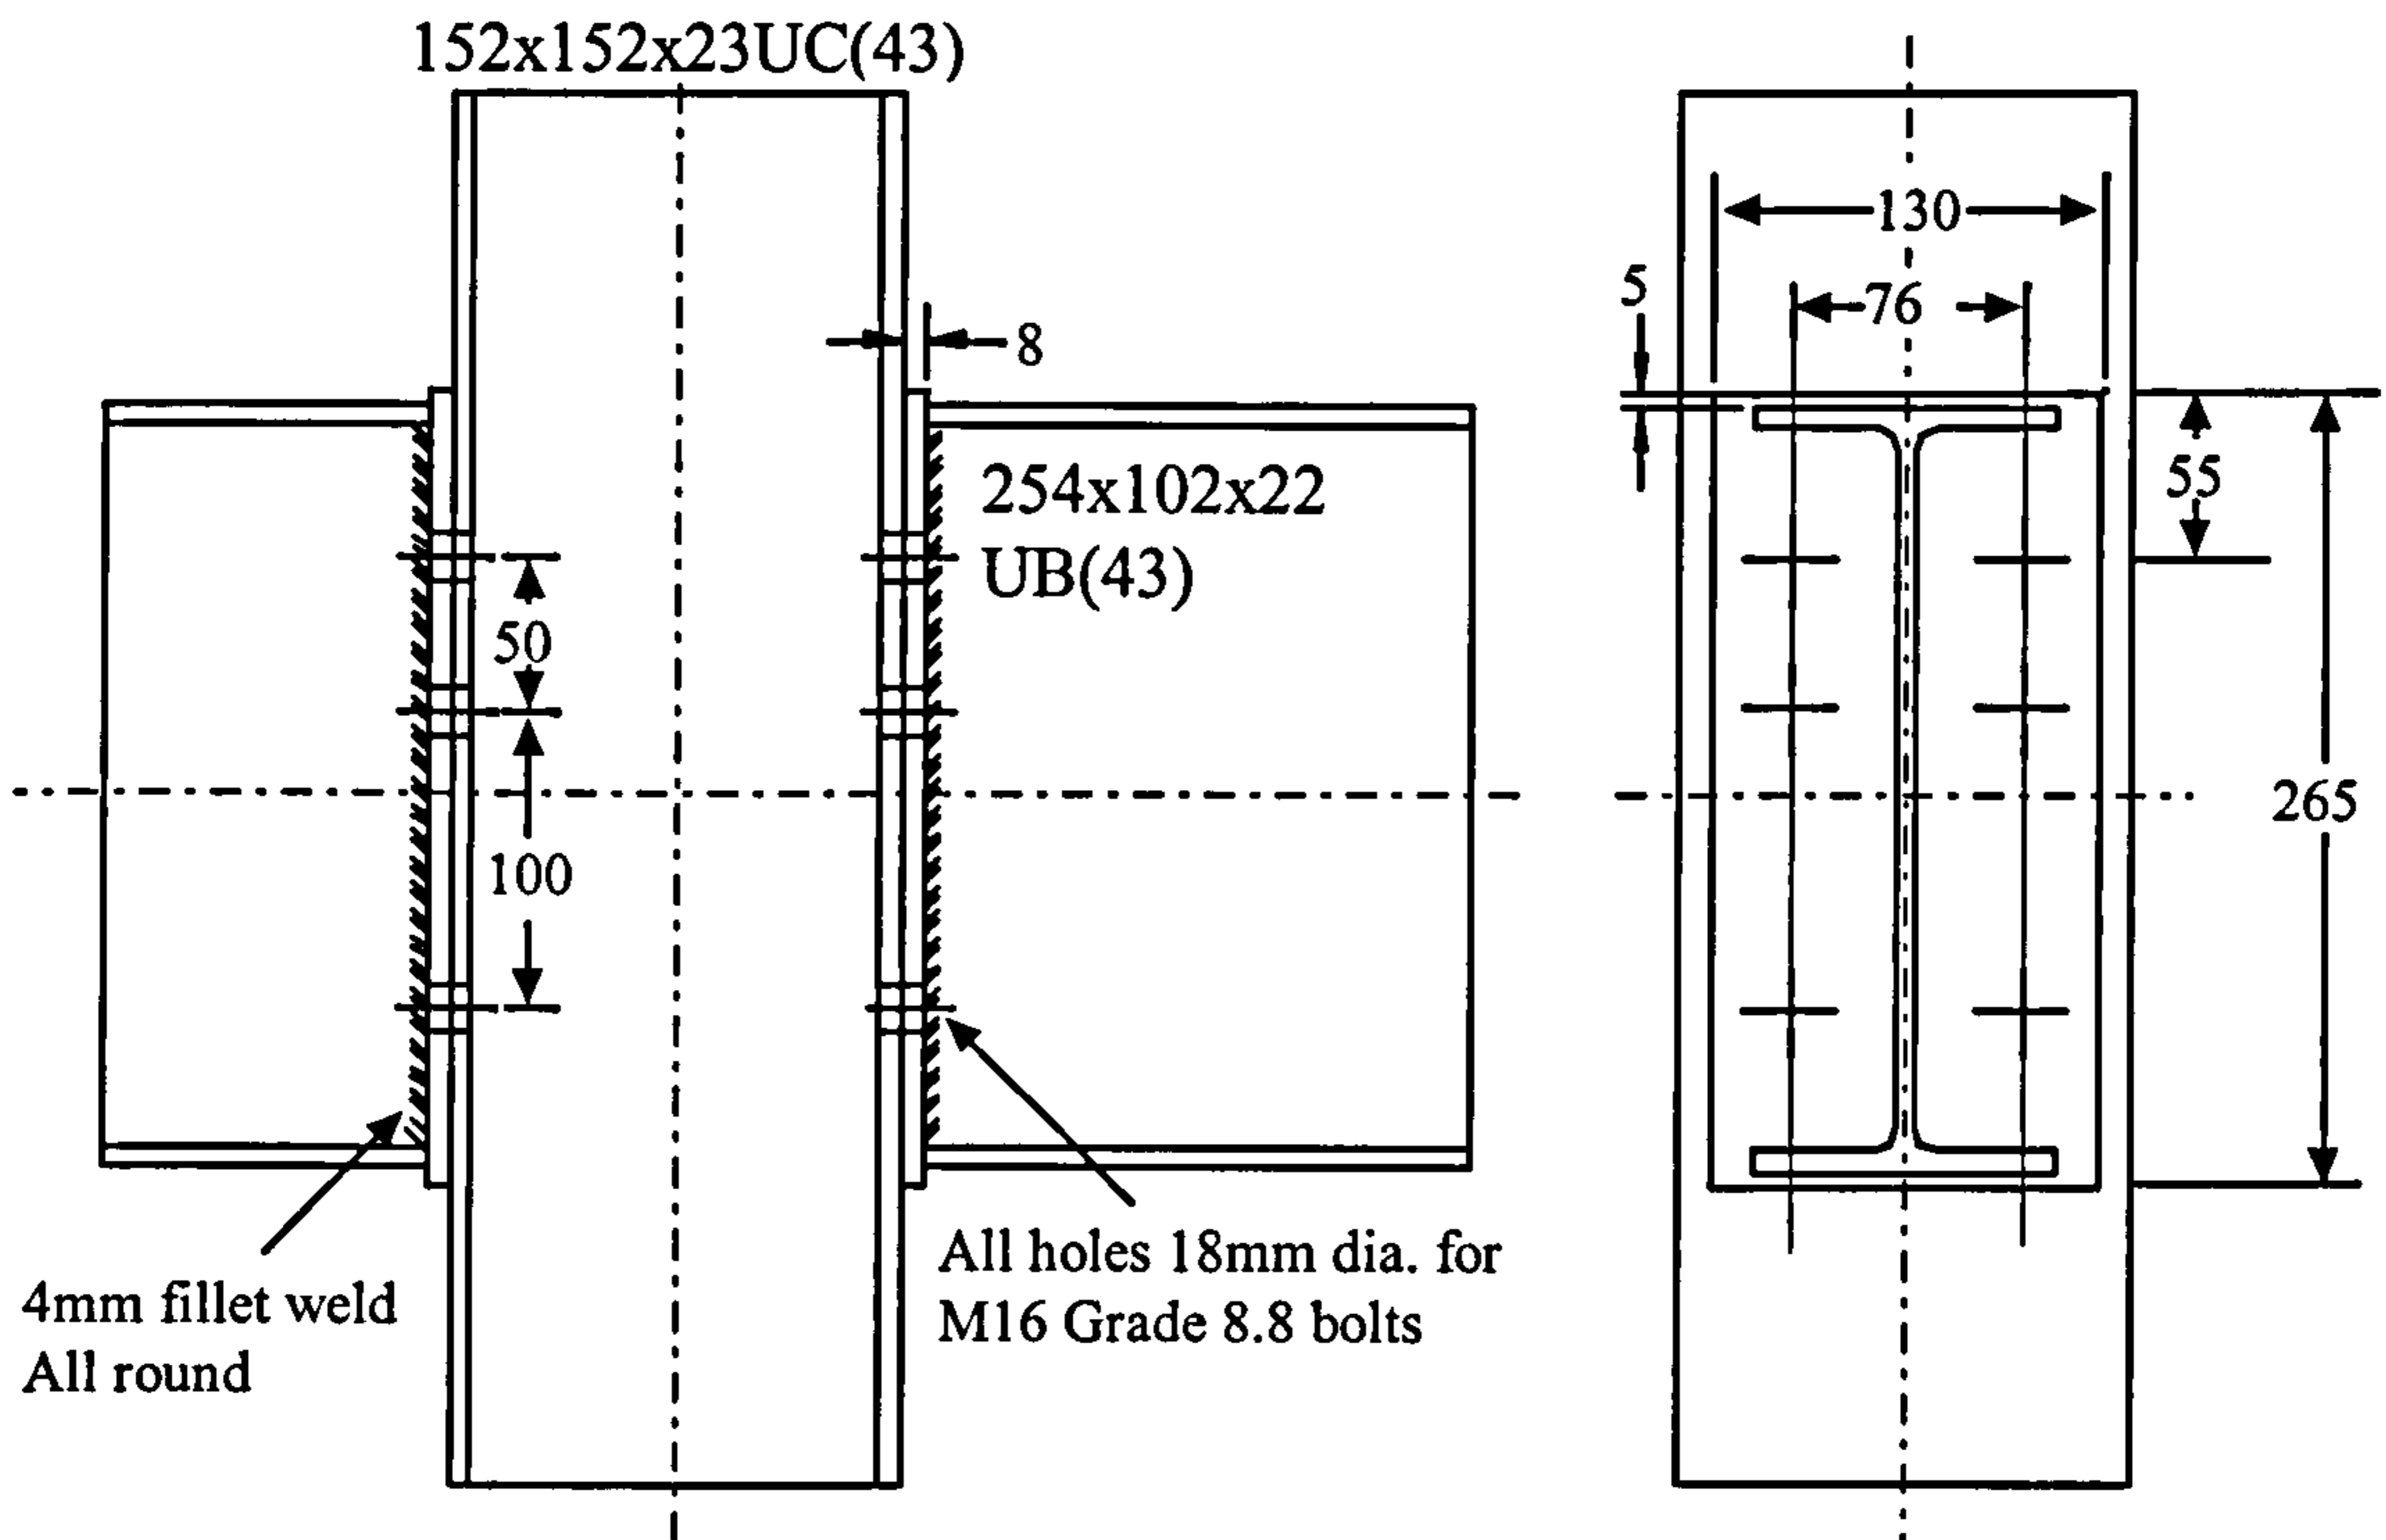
Bare-Steel Flush End-Plate Connection Detail (Group 1)
